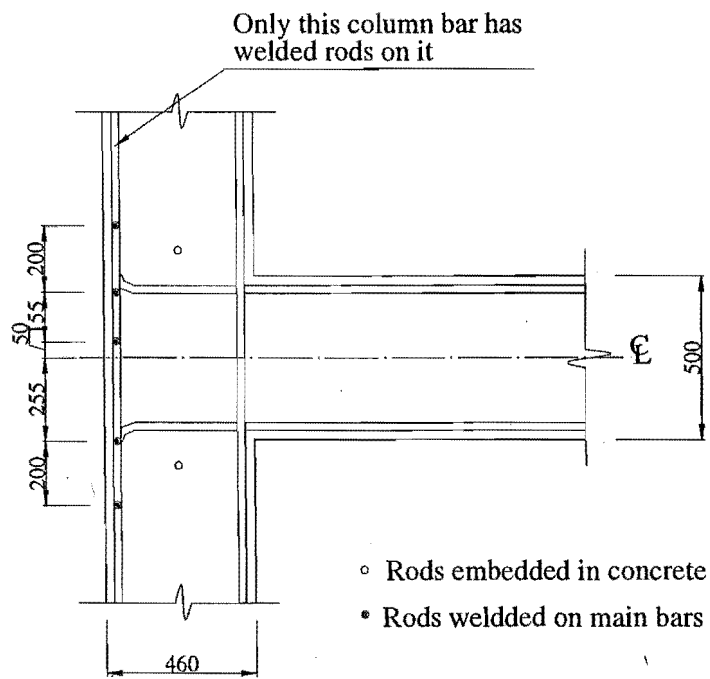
Positions of Steel Studs Welded on the Steel to Mount the Linear Potentiometers for Interior Beam-Column Joint Units
